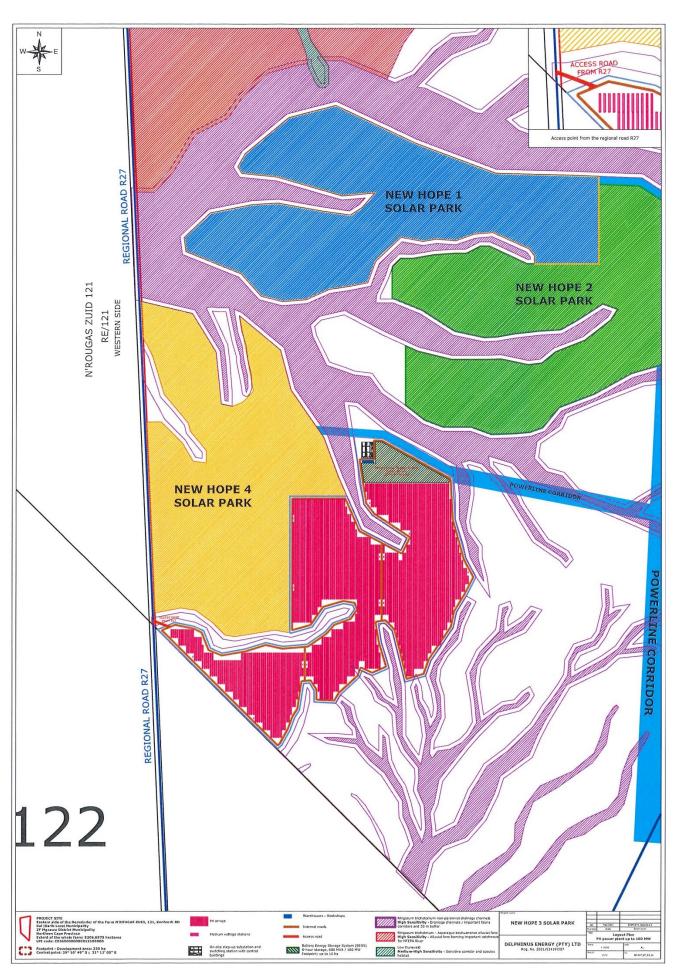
Proposed Layout Plan of the New Hope 3 Solar Park
